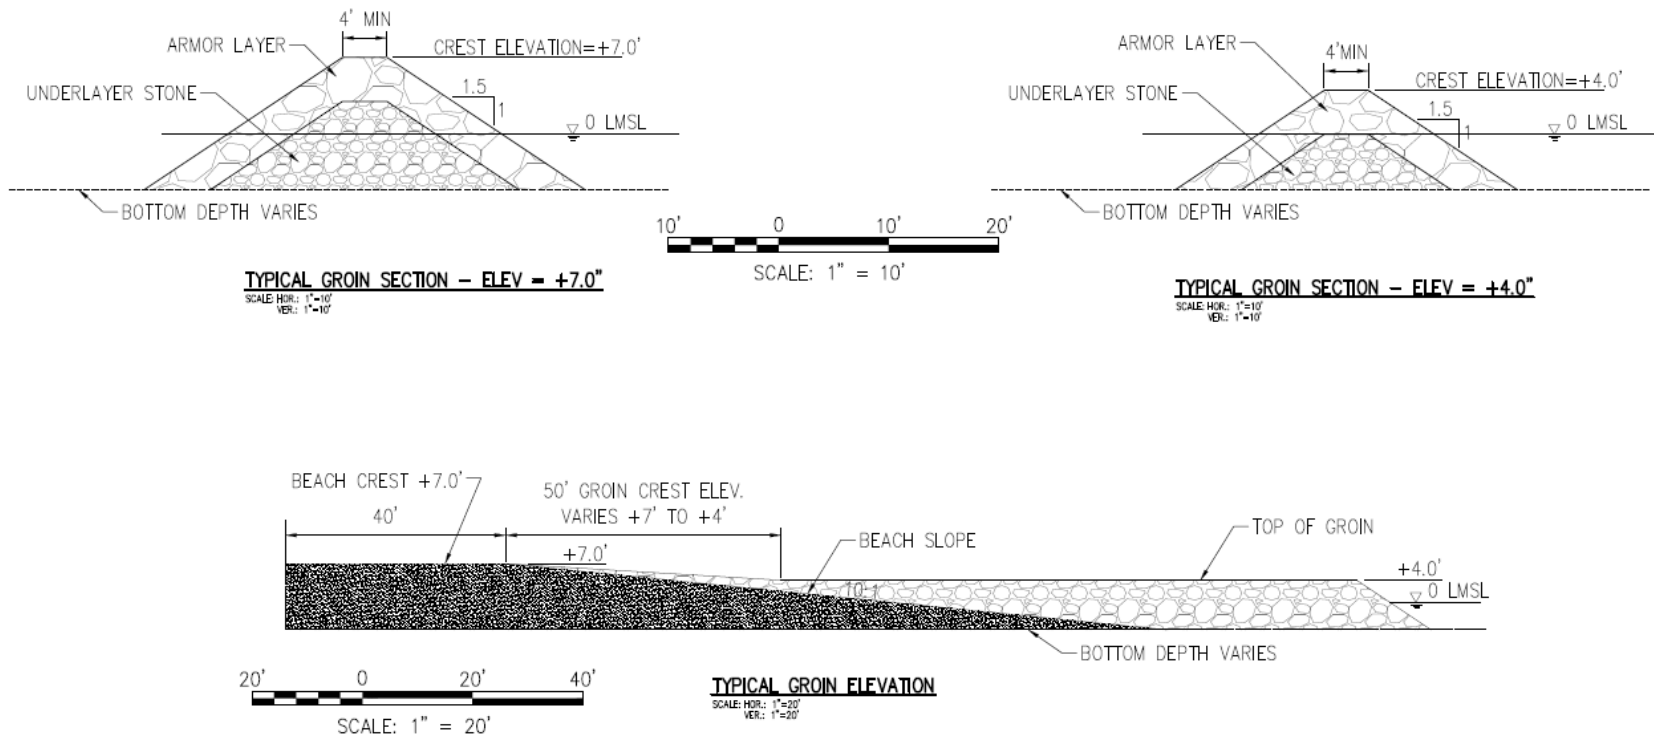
Typical Cross Section of Groin and Beach Fill
